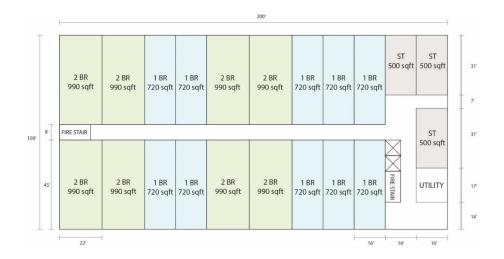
A floor plan detailing the layout of the residential units on floors two through five of Elkhorn Crossing
